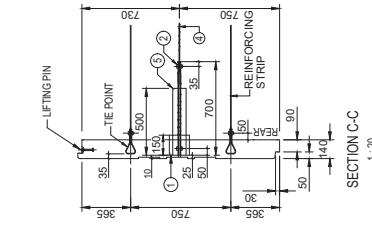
DETAIL OF IN-SITU CONCRETE ON TOP OF PANELS
